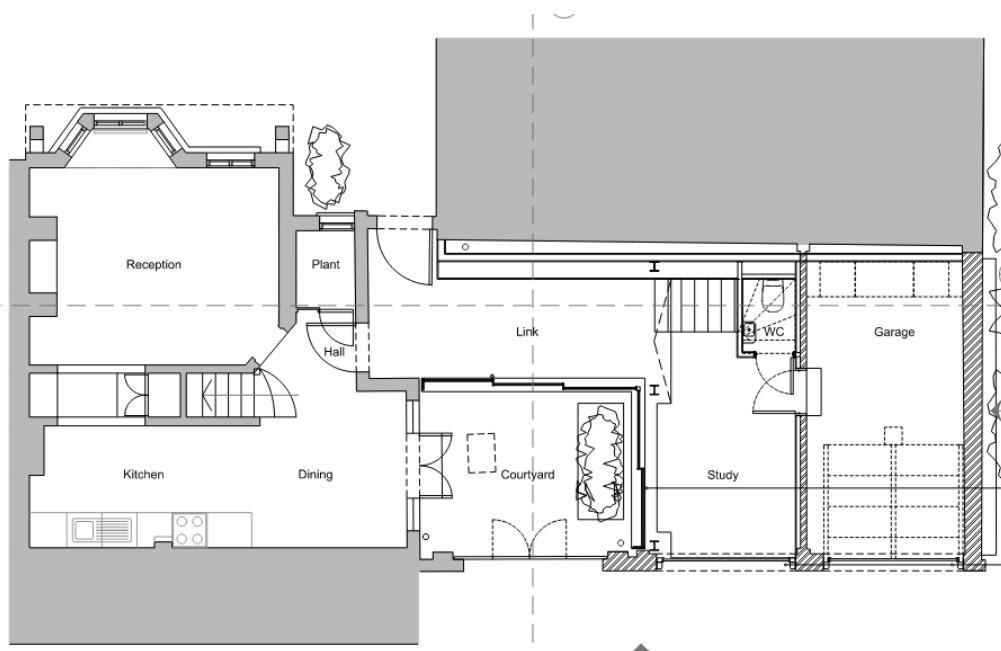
Proposed ground floor plan as approved under application ref. 2018/0191/P
